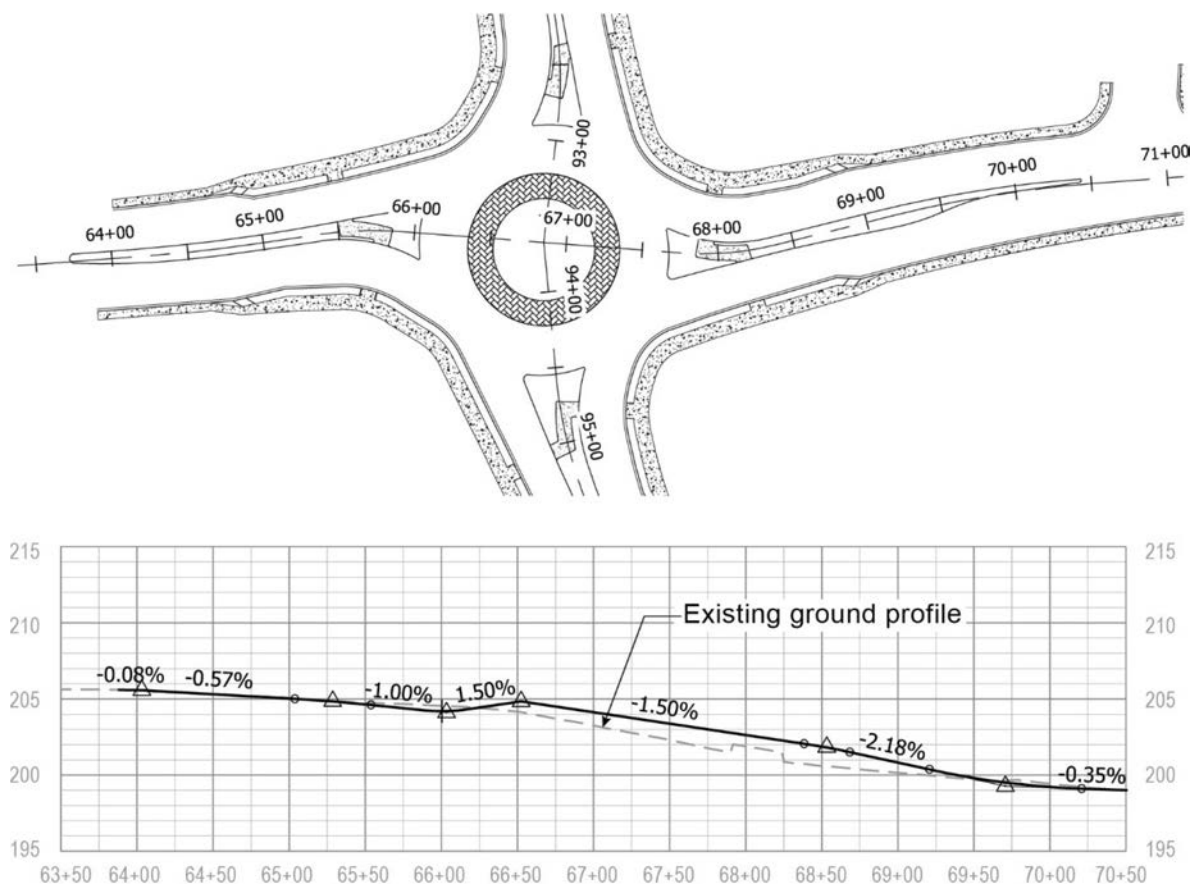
Example of plan of roundabout alignment and existing ground profile.
